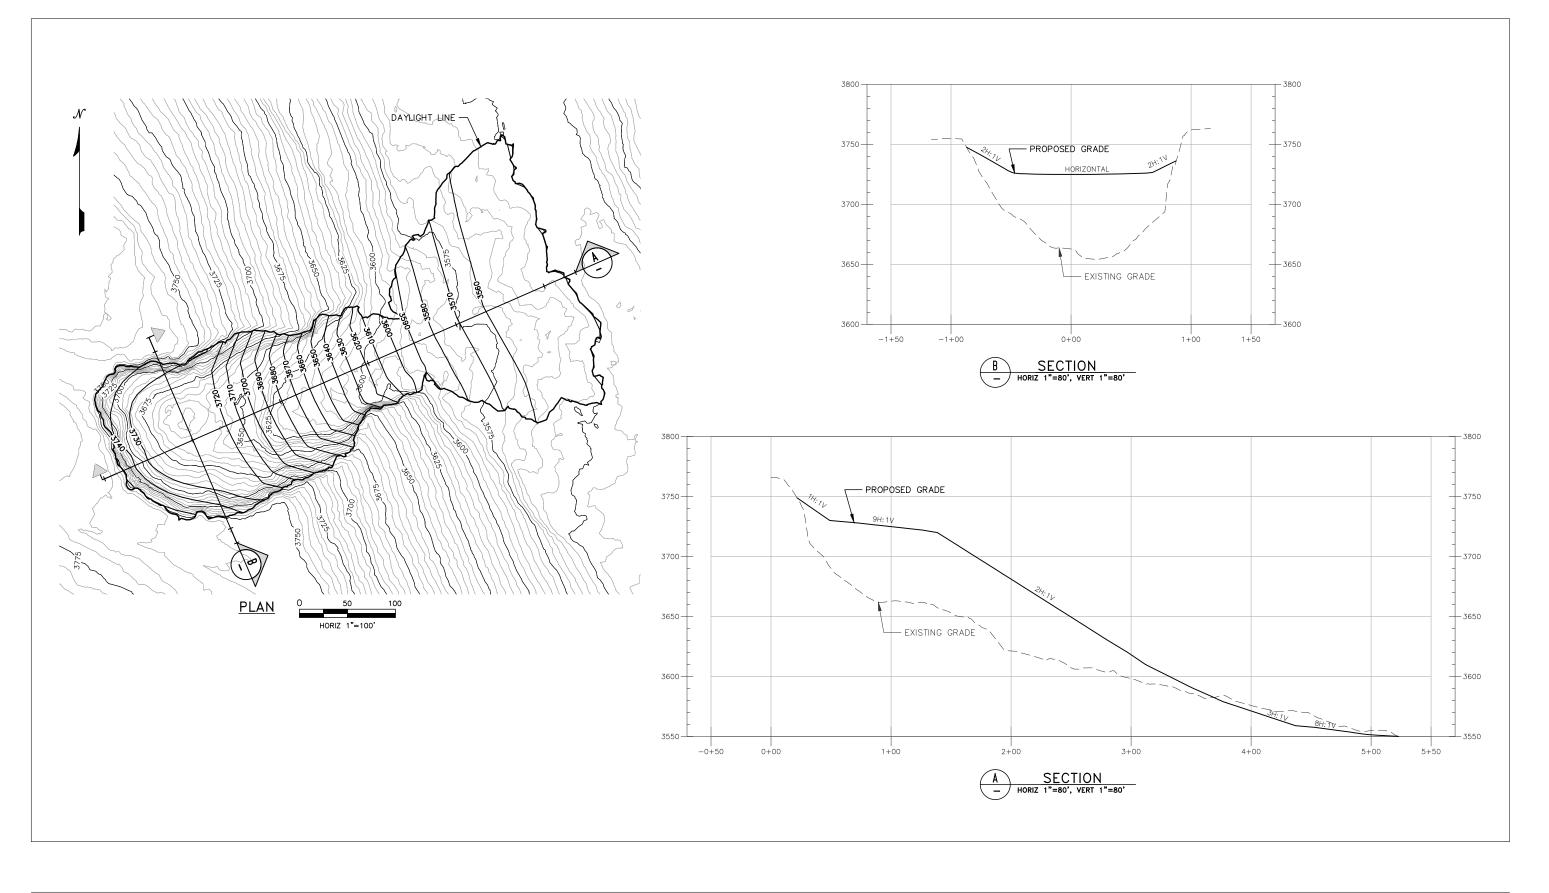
J.C. Boyle Forebay Spillway Scour Hole Backfill Plan & Sections
